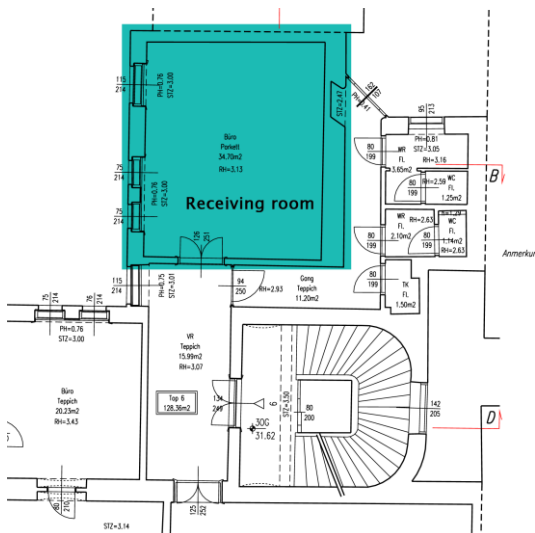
Floor plan 3rd level- Receiving room, Total floor area  $A=34,53m^2$ , height  $H=2,81m$ , Volume  $V=97m^3$
